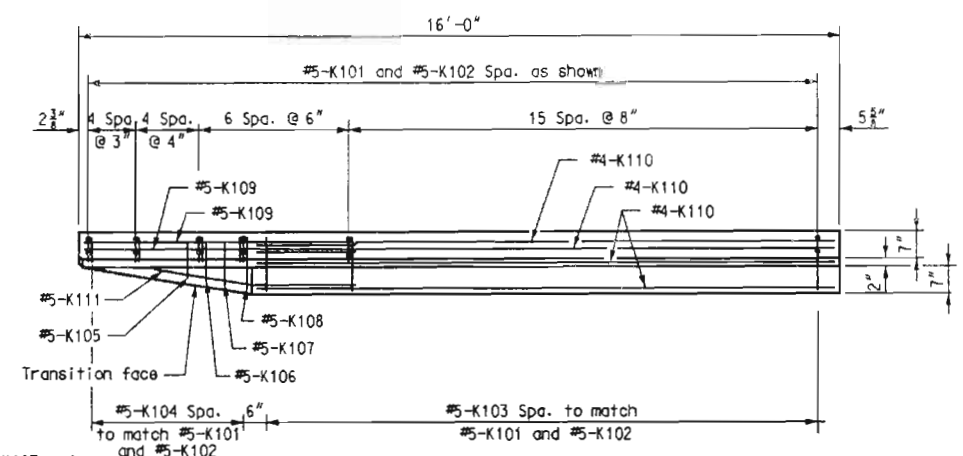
DETAILS OF SAFETY BARRIER CURB AT CLOSURE POURS
